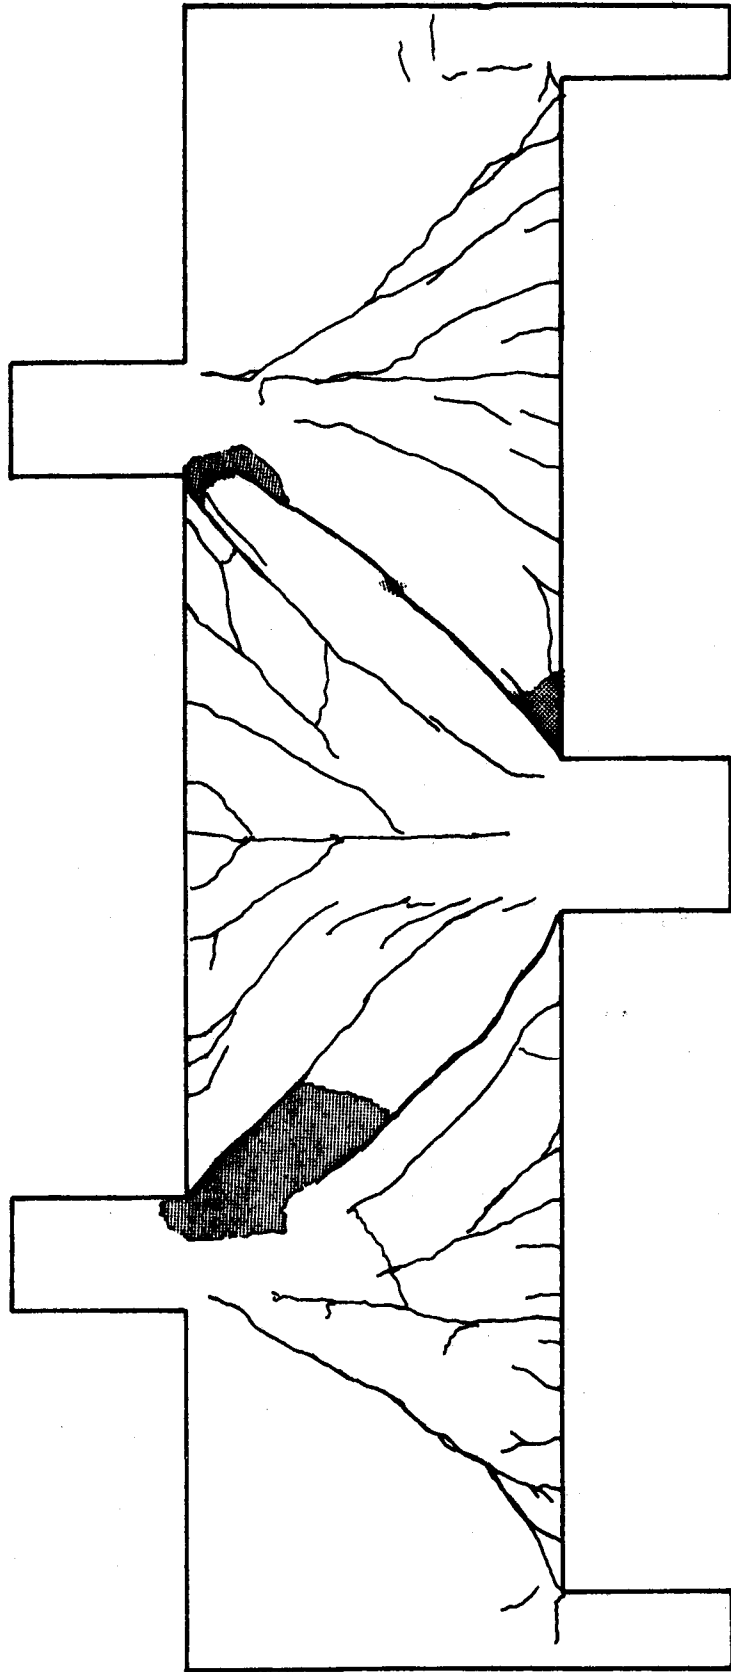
Beam 4/1.0 Crack Pattern - West Face
